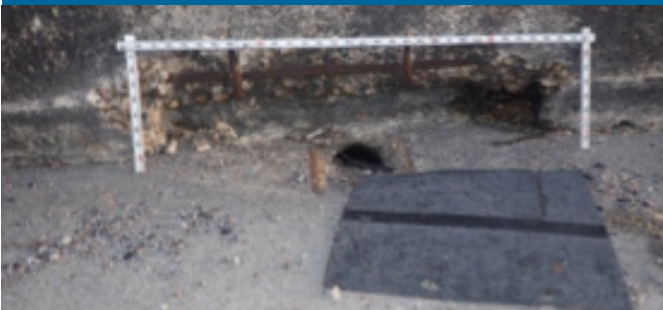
Concrete Spall/Delamination on Roadway Deck at Span 1
